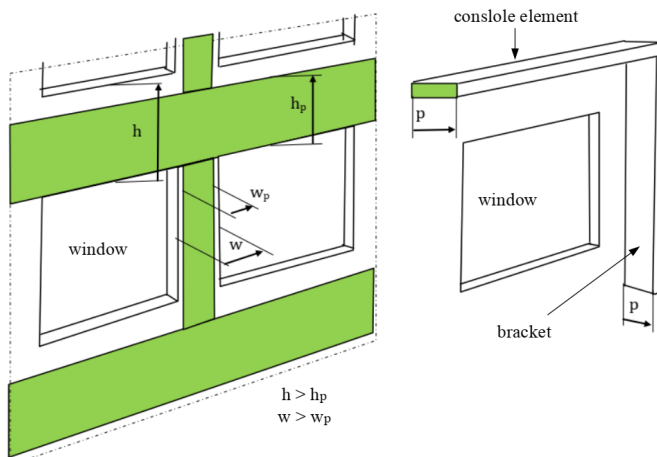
Horizontal and vertical fire barriers on façade - continuous bands (on the left) and continuous console element supported by the vertical bracket (on the right) [13].
